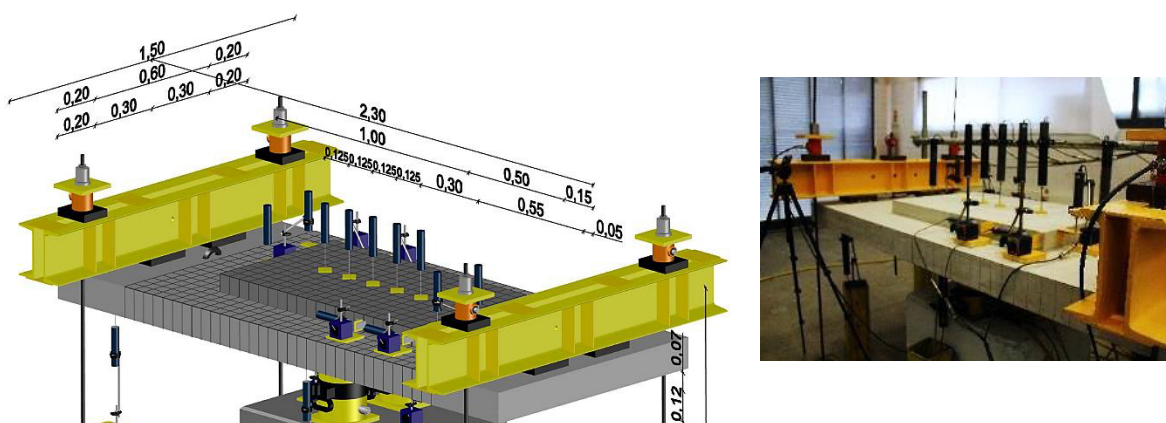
General test layout for  $R_S$  (short overlay) geometry: conceptual and real test setup.
